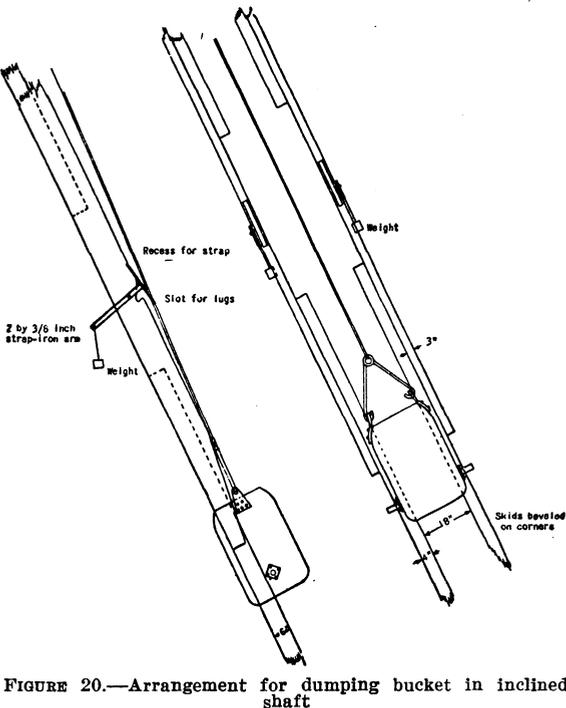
Arrangement for dumping bucket in inclined shaft
